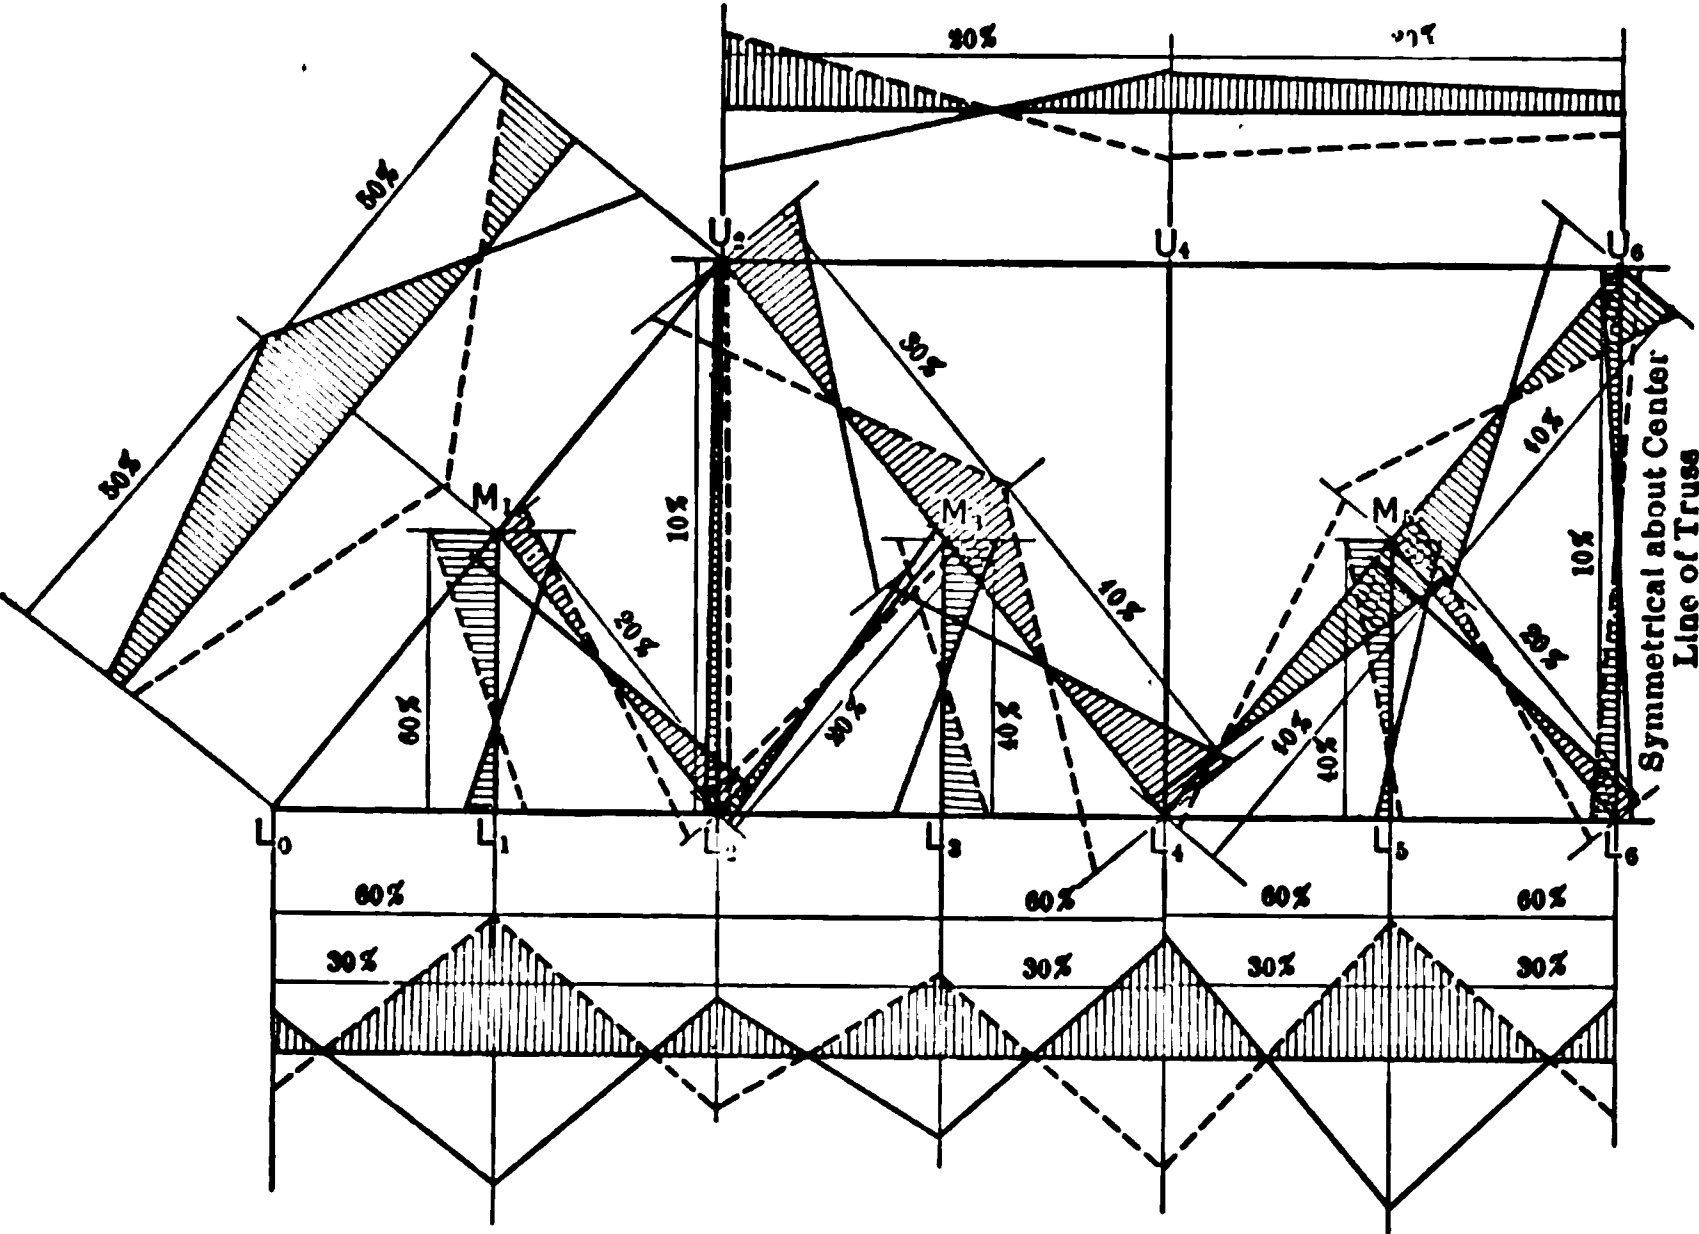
Secondary Stresses in a Subdivided Pratt Truss.
